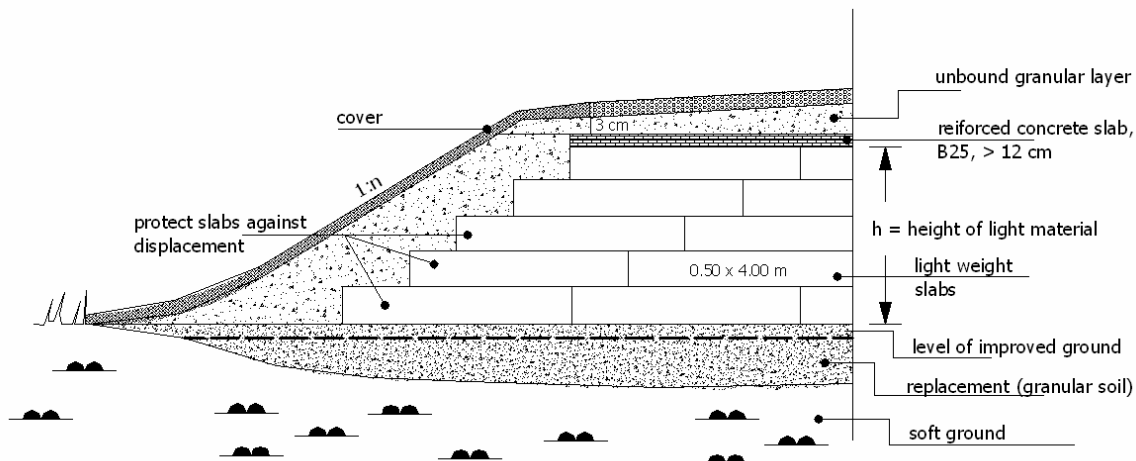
Example of embankment construction by using slabs of extruded polystyrene with cement-concrete protection above the slabs
